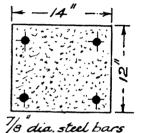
Reinforced Con-CRETE COLUMN SECTION.
